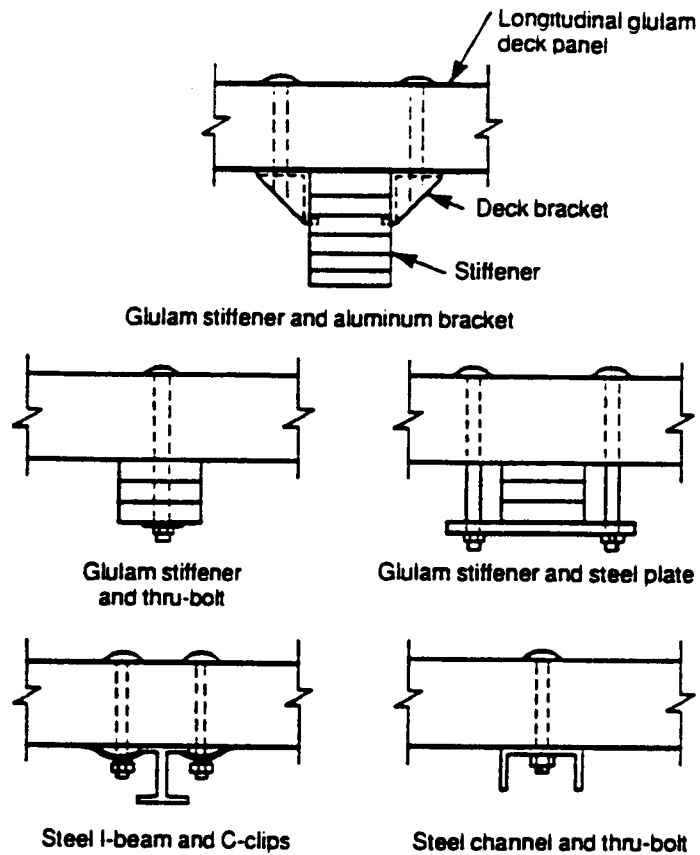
Attachment of Stiffener Beams to Longitudinal Glulam Decks
